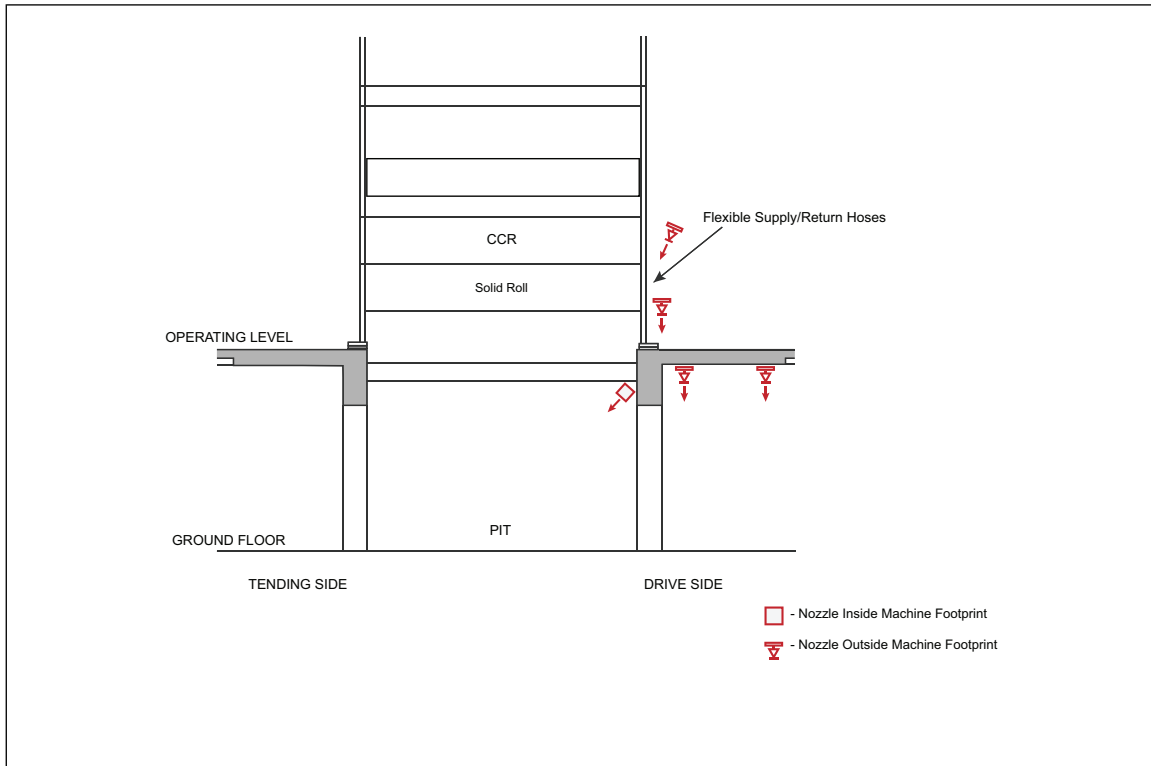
Example nozzle locations for swimming roll or control crown roll flexible hose rupture (elevation and cross machine direction)
